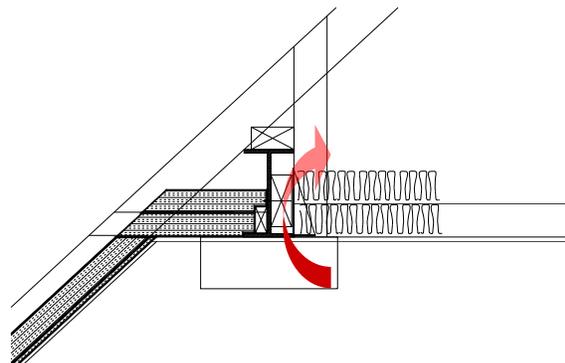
Steel purlin design – significant thermal bridge and high condensation risk³.
